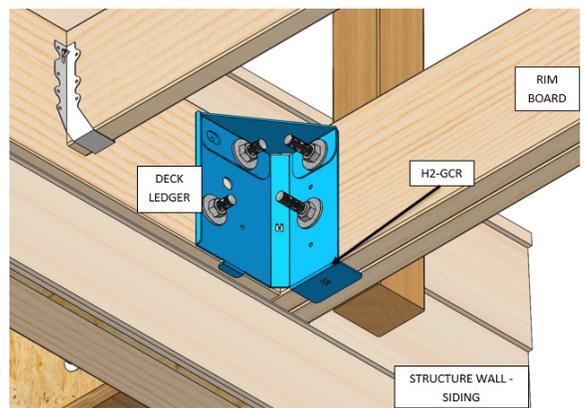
TYPICAL SIDING CORNER BRACKET (H2-GCR OR H2-GCL) INSTALLATION
